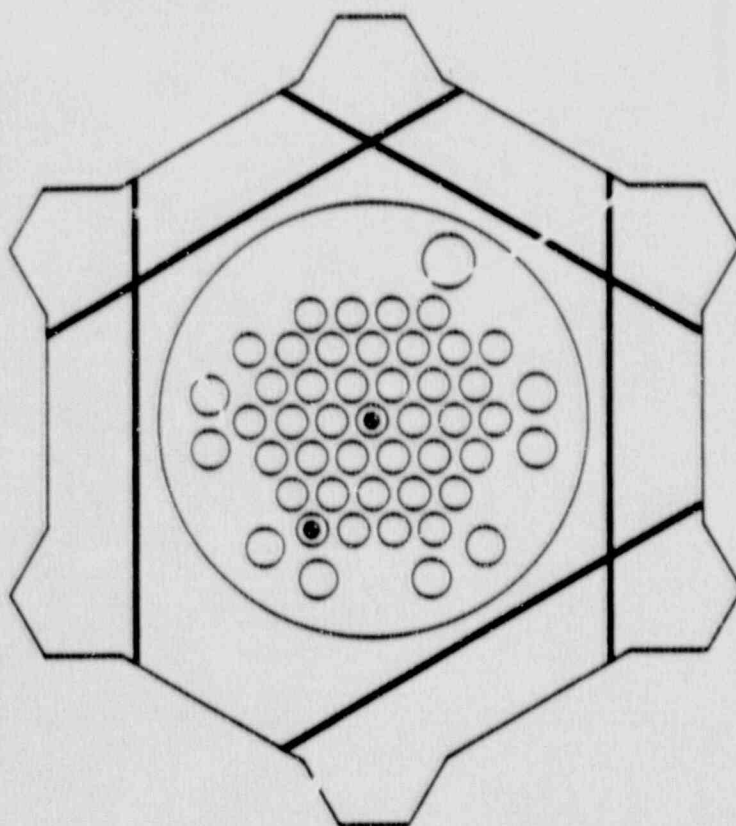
PCRV Top Head Cutting Arrangement
